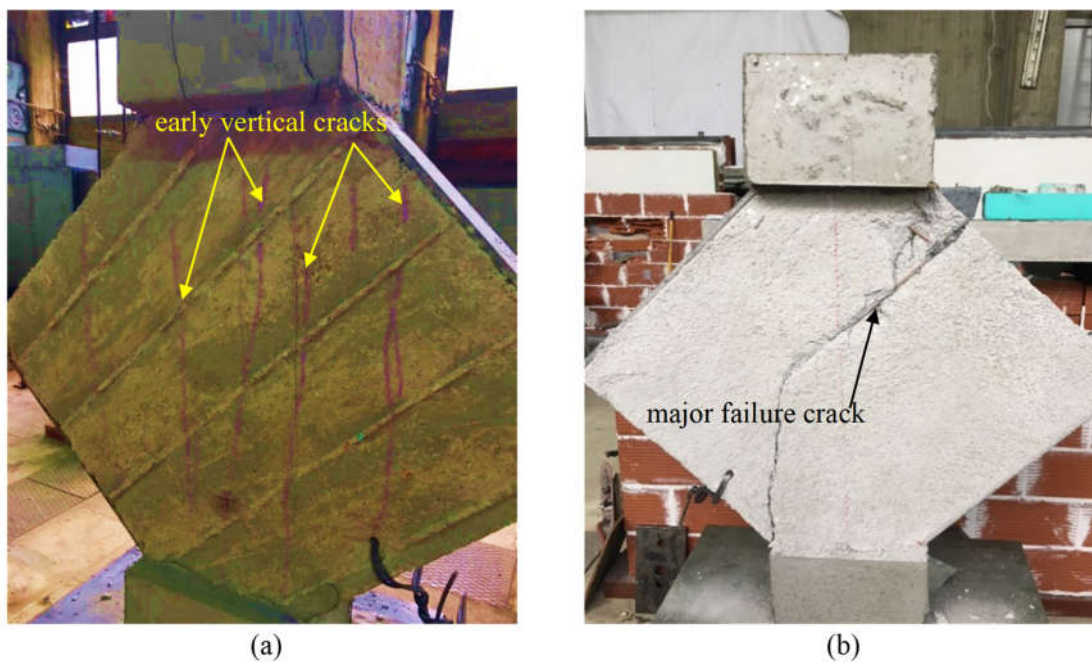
Failure mechanism of PCSP-3a specimen under diagonal compression: (a) vertical cracks on the concrete panels at early loading stages and (b) major failure crack on the concrete panels.
